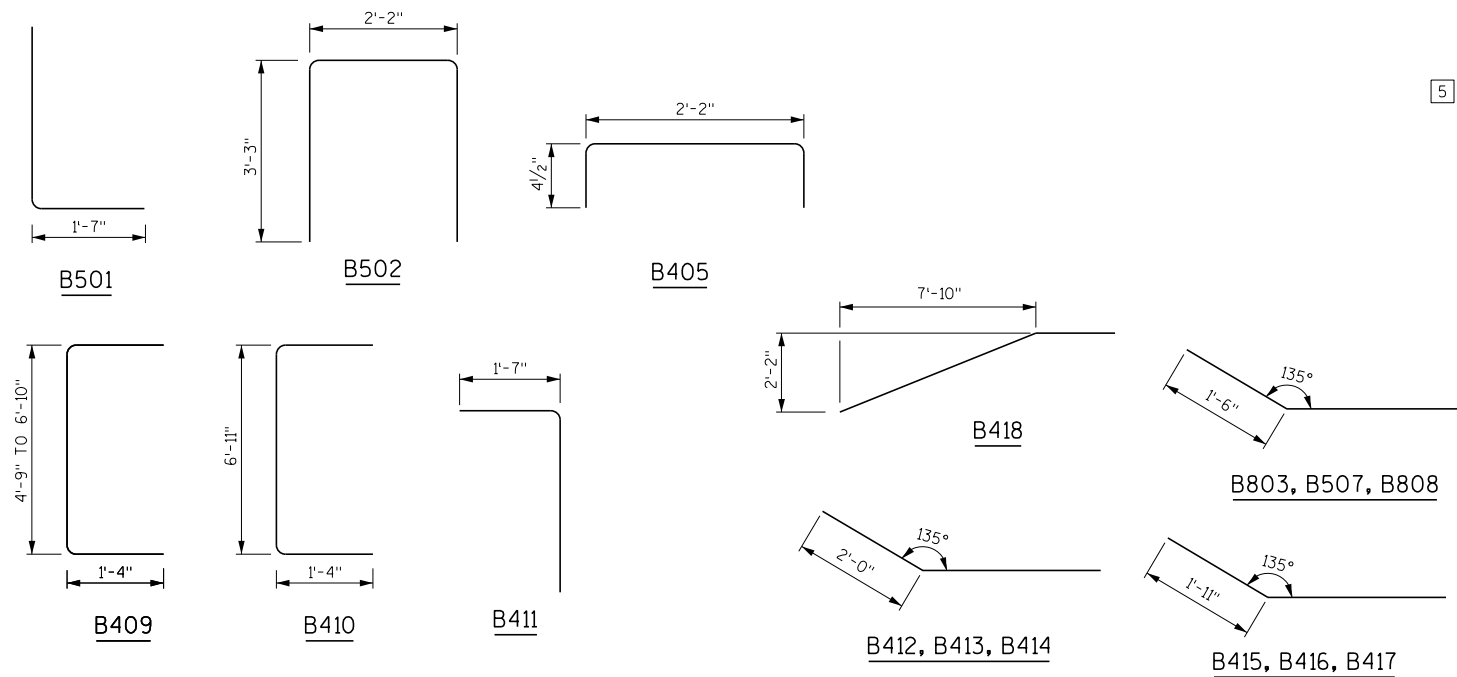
is a cross-sectional diagram of the abutment and pile cap reinforcement. The diagram shows the following details:
